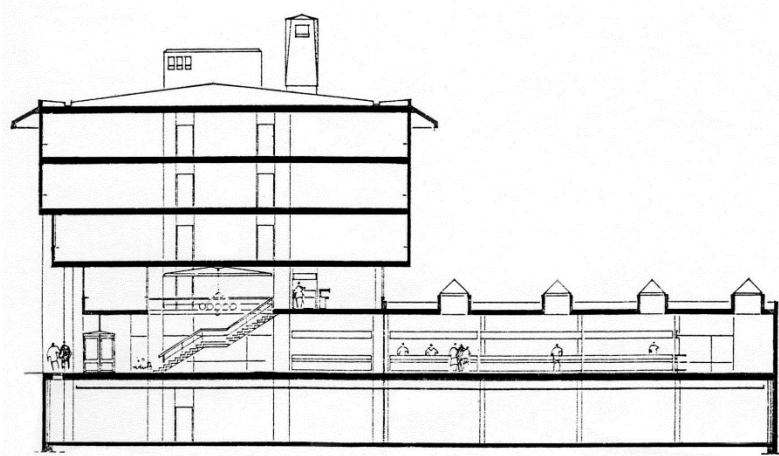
Section drawing of Ziraat Bank Bakırköy Branch, 1969
